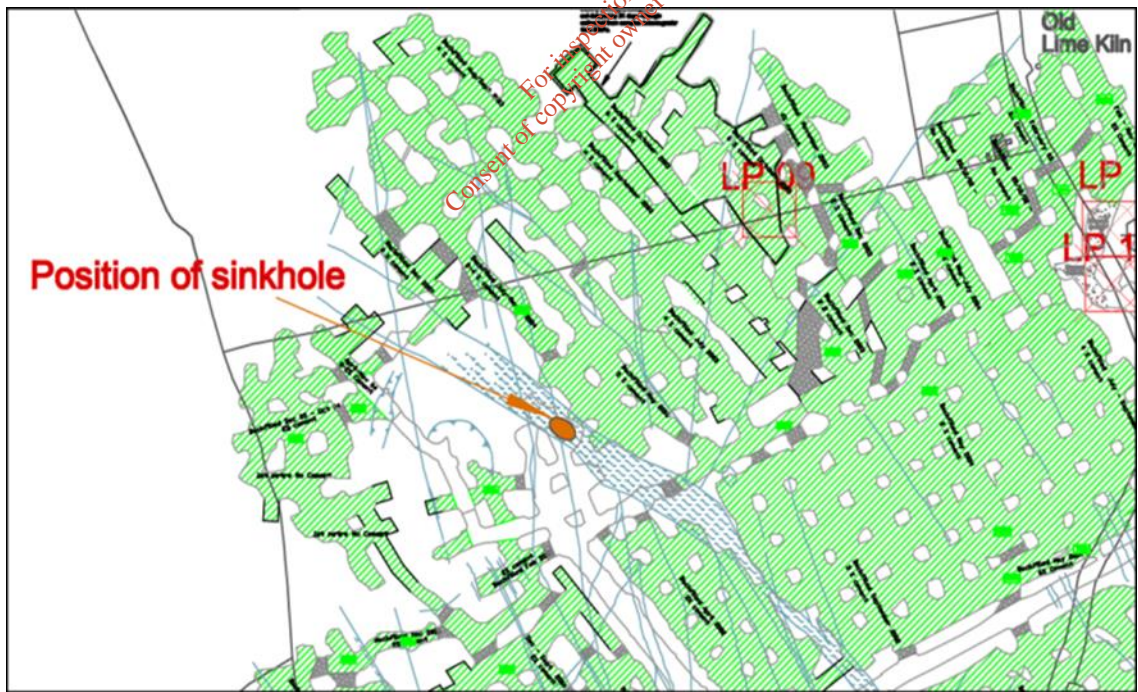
Plan showing relative location of the Main Fissure, sinkhole and mine working
